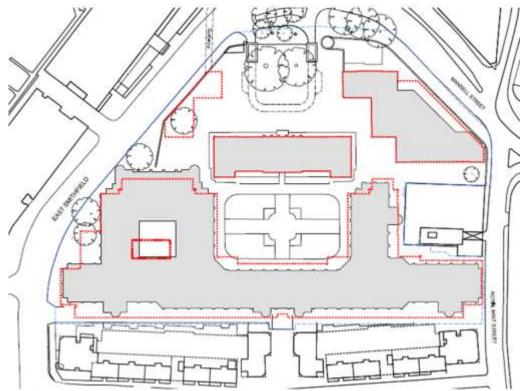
Existing typical floor plan (shaded area) and proposed floor plan marked by overlaid dotted line
